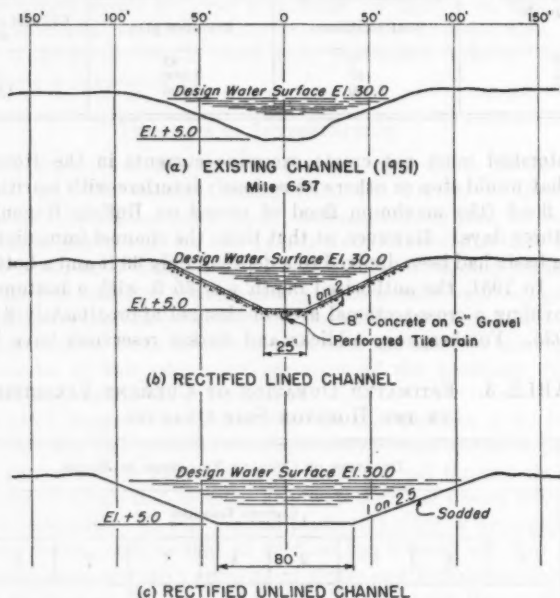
TYPICAL CROSS SECTIONS OF BRAYS BAYOU
